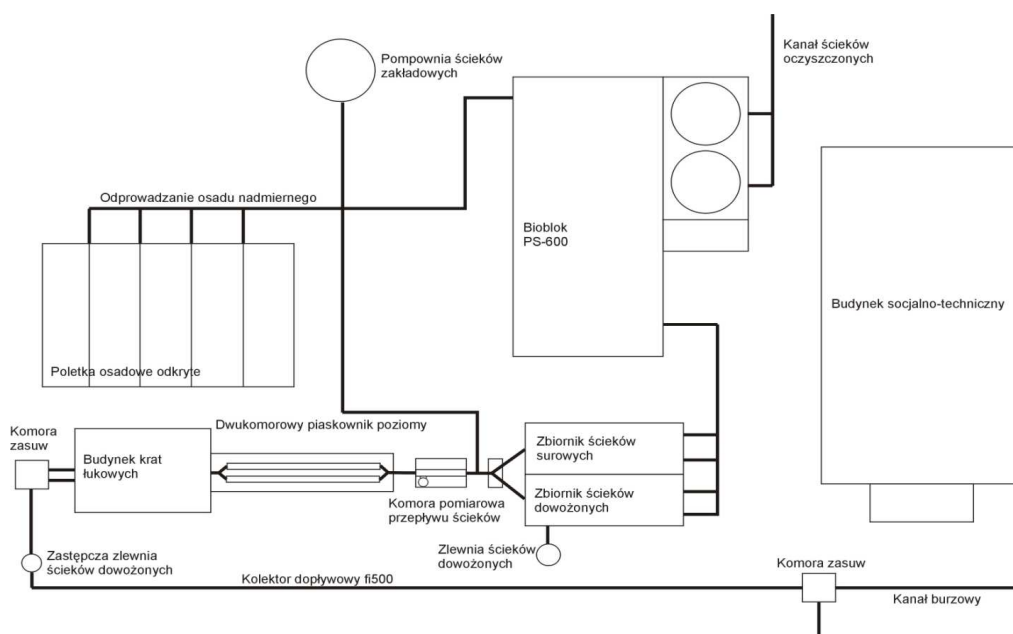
Layout of sewage treatment plant in Piekoszów – an actual state
